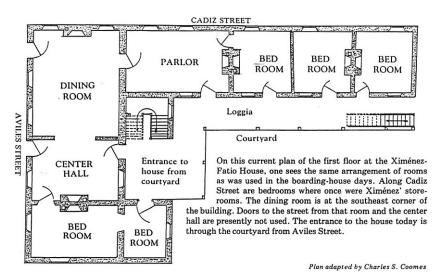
First story floor plan of the Ximénez-Fatio House, with south at the top of the diagram (Waterbury 1985).
